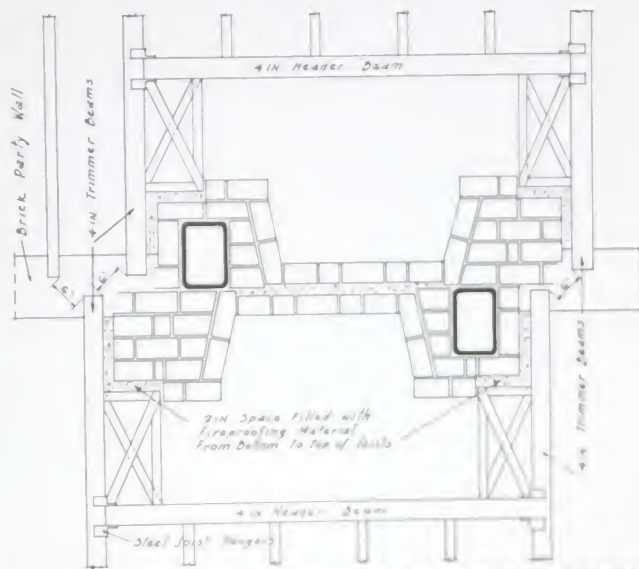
METHOD OF BUILDING TWO FIREPLACES BACK-TO-BACK IN A BRICK PARTY WALL TO SECURE PROPER SPACING BETWEEN ENDS OF FLOOR JOISTS.
